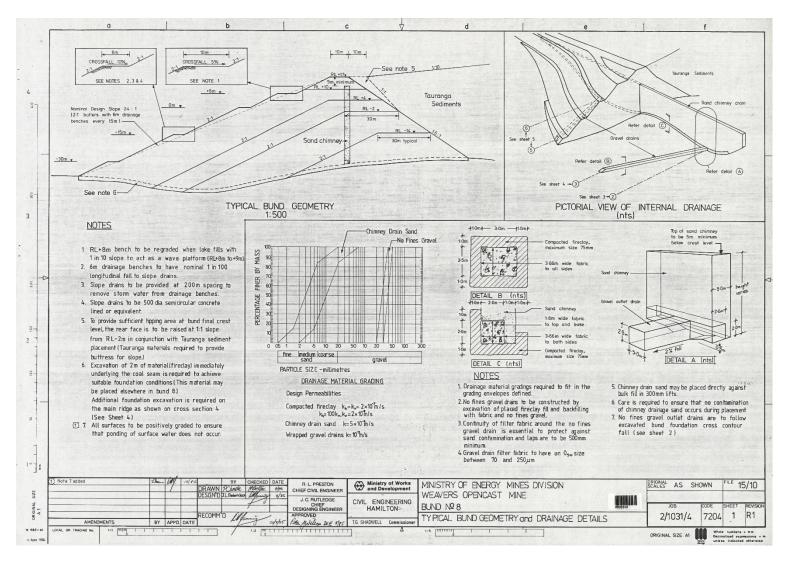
Engineered Earth Bund Wall (No 8) designed to retain mine spoil and form southern wall of Lake Puketirini.
